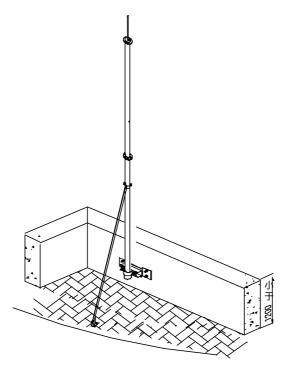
Antenna support fixed on parapet (with parapet shorter than 1200MM)
